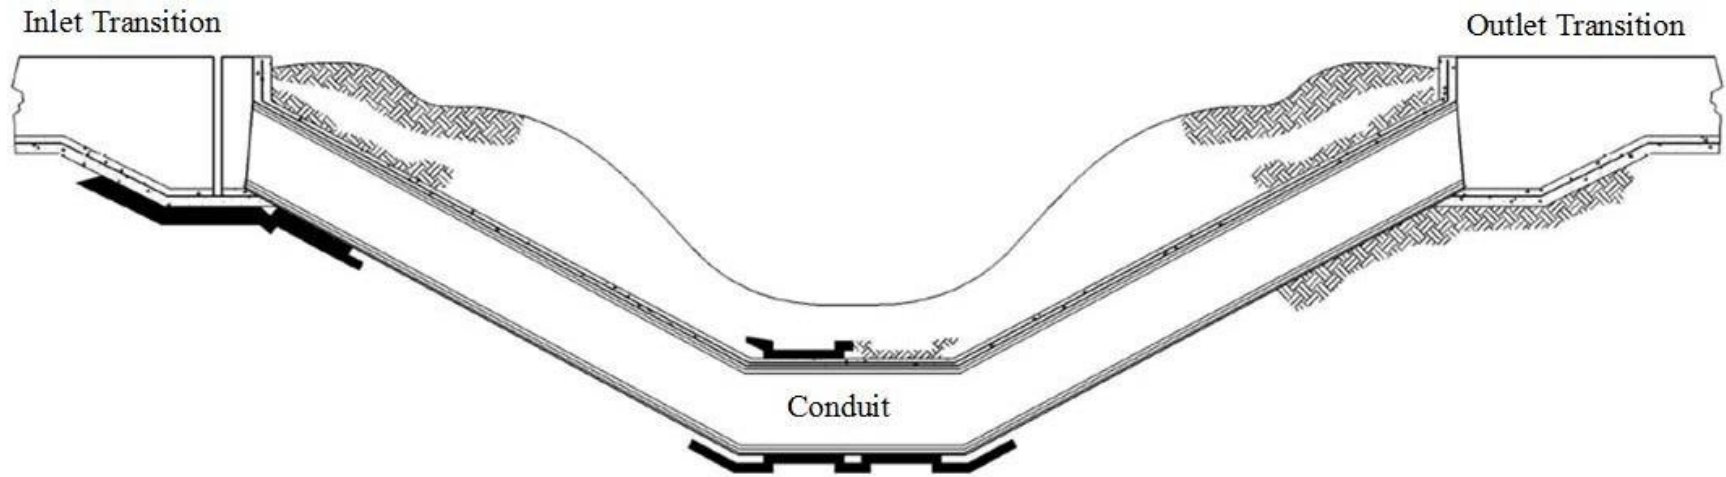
Cross-section of a proposed inverted siphon at a river showing the outline of the conduit
